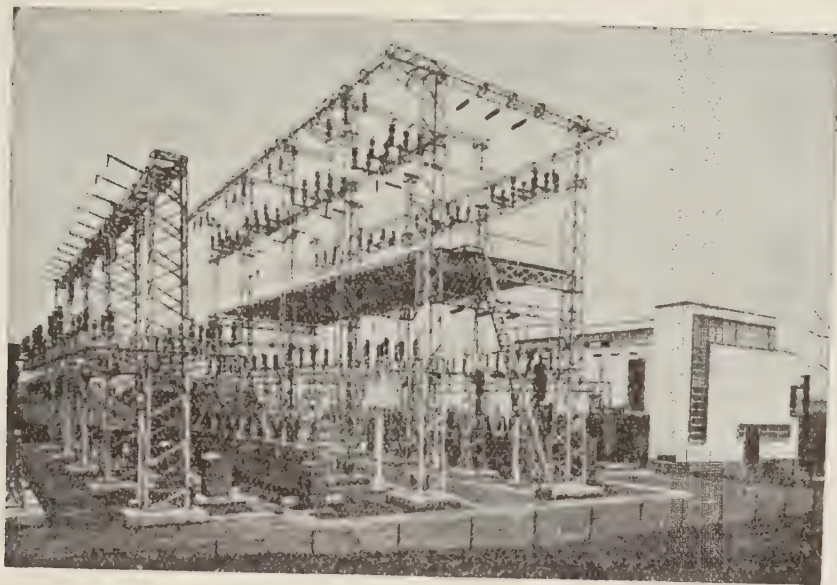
Exterior view of Condé-sur-Huisne sub-station showing high-tension equipment and building.
